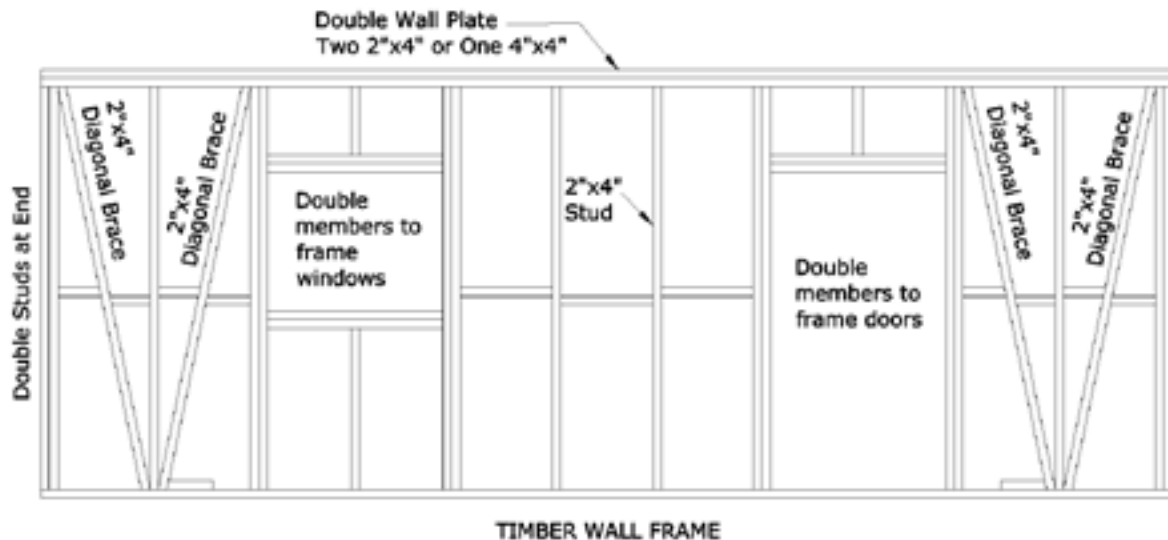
LAYOUT OF WALL TIMBER FRAME
